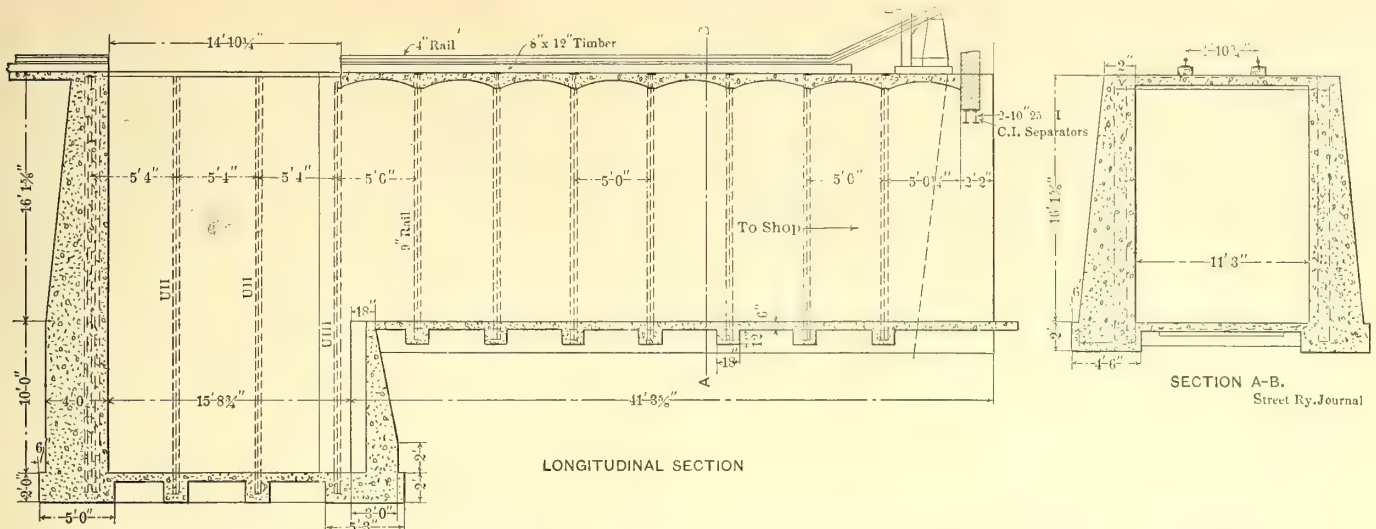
LONGITUDINAL AND CROSS-SECTIONS OF THE TUNNEL UNDER THE ELEVATOR TRACK OF INSPECTION SHED AT THIRTY-SIXTH STREET, USED FOR CONVEYING TRUCKS TO THE OVERHAULING SHOP
